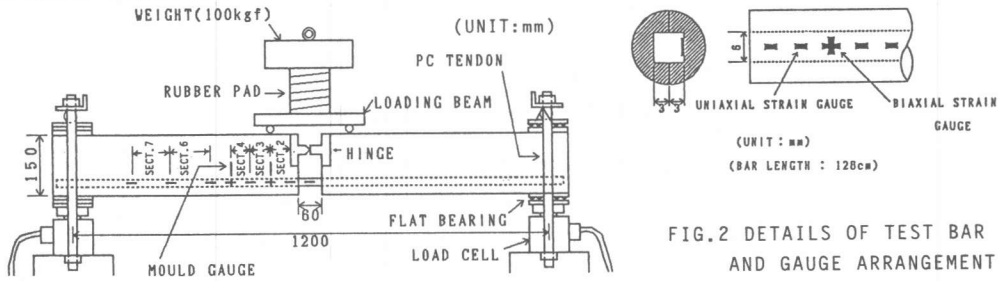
DETAILS OF SPECIMEN AND IMPACT TEST SET-UP
